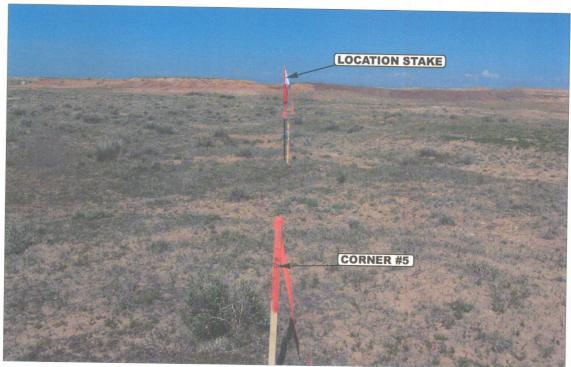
PHOTO: VIEW FROM CORNER #5 TO LOCATION STAKE
